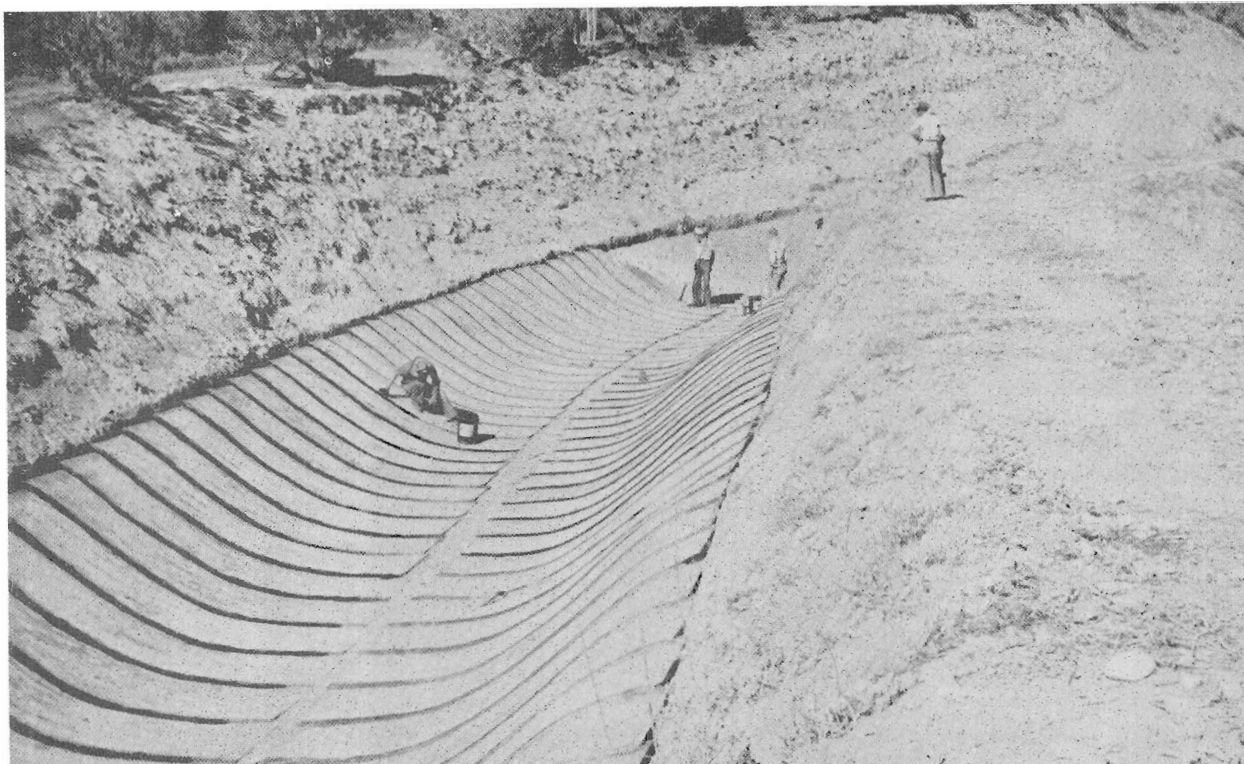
Installation of exposed prefabricated asphalt canal lining on the Paonia project, Colorado. P551-D-14663.
